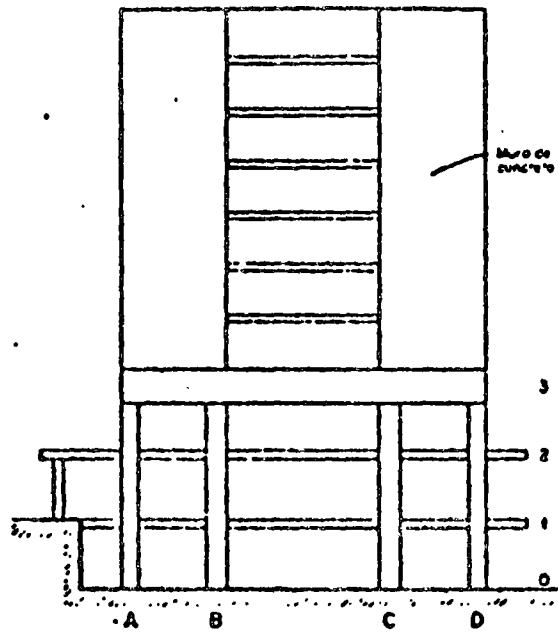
Schematic cross section of building damaged during Caracas 1967 earthquake (After ref. 17).
